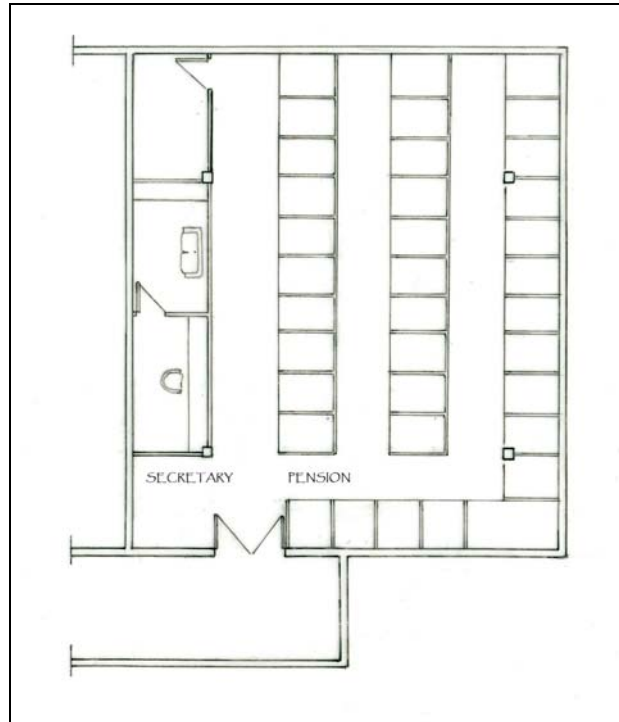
Basement Floor Plan of Ankara Veterinary Medical Center
